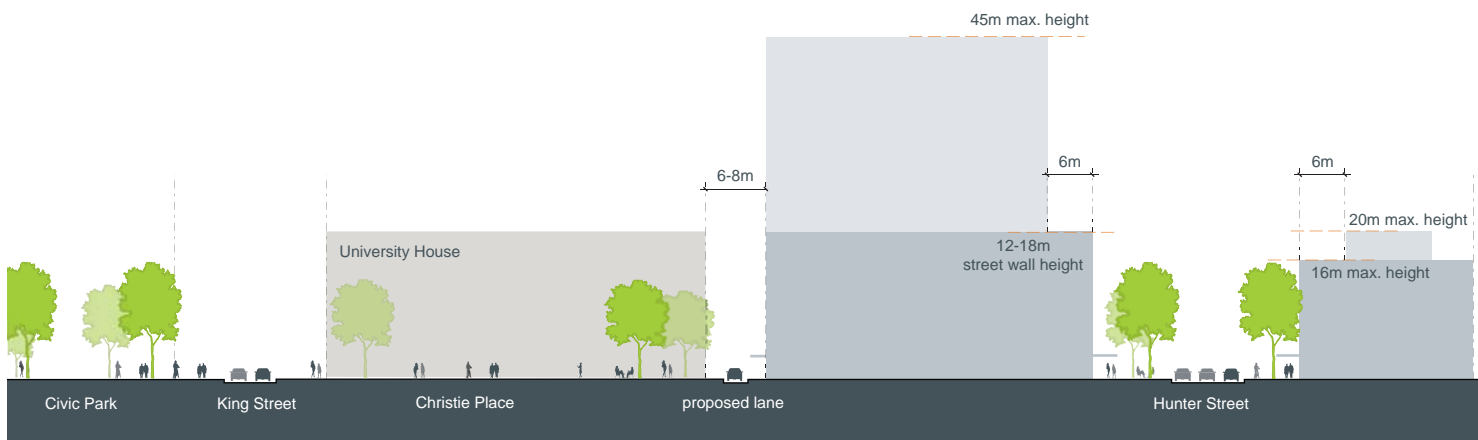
Section through Christie Place and the university site showing building form and setbacks
